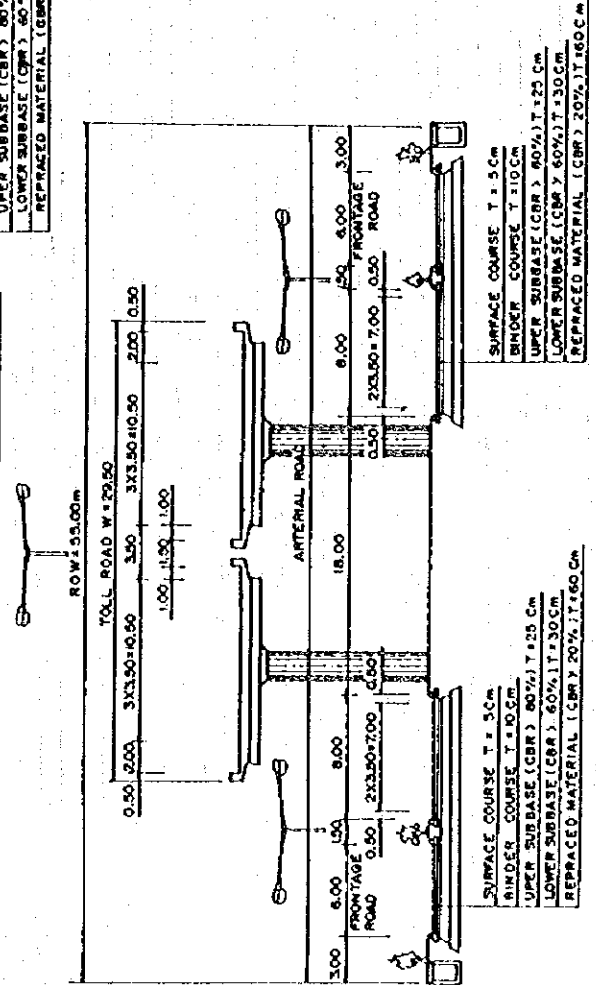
Typical Cross Sections for Route-1(2/2)
